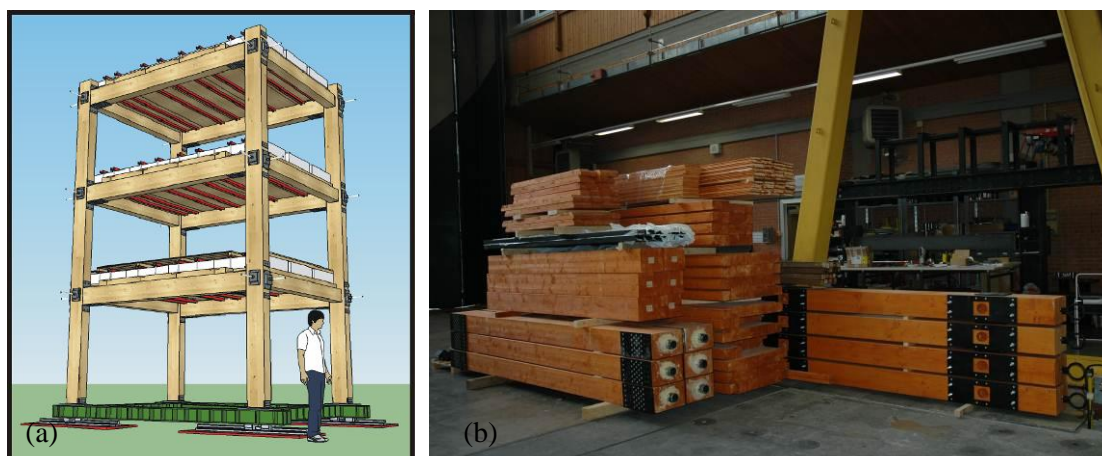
2/3 scale post-tensioned glulam test frame a) design sketch and b) pieces waiting to be assembled
